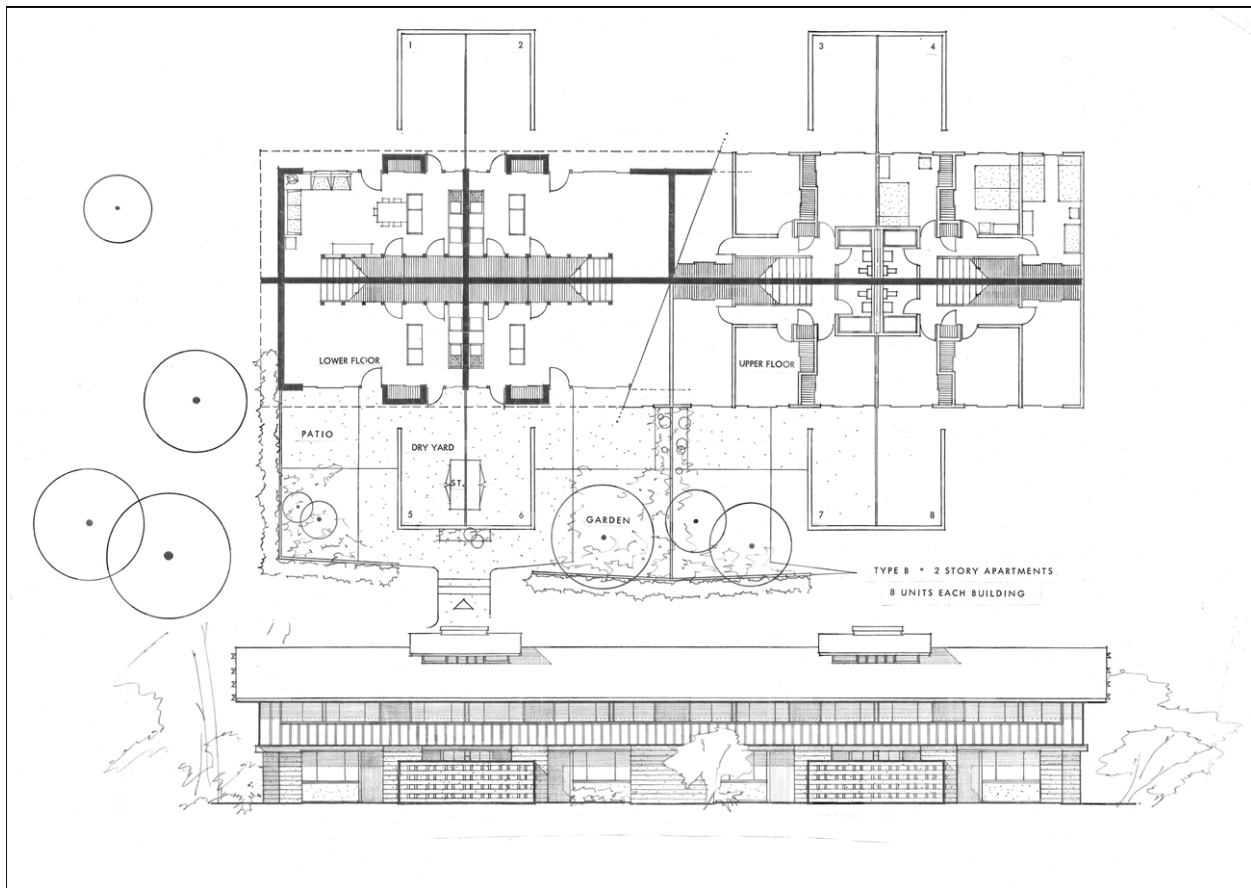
Presentation Documents, Type B Apartments, Floor Plans and Elevation, circa 1957
